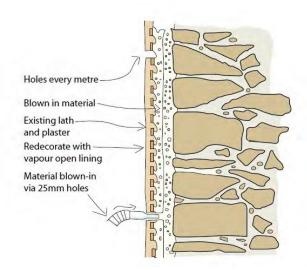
Insertion of insulation between lath/plaster layer and stone walls. Source: Jenkins and Curtis, 2021.
